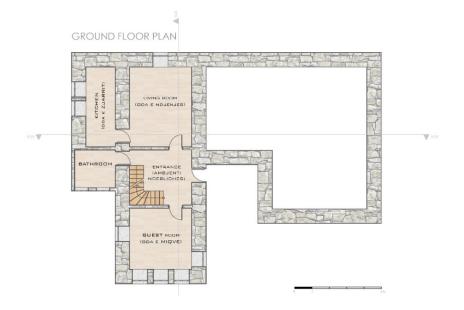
Beqiri, A. (2024). Adem Zeko House Ground floor
